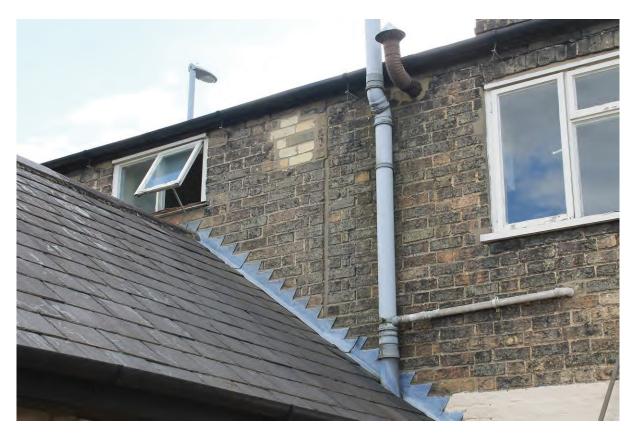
Straight Joint in Northern Elevation showing addition of Carriageway
